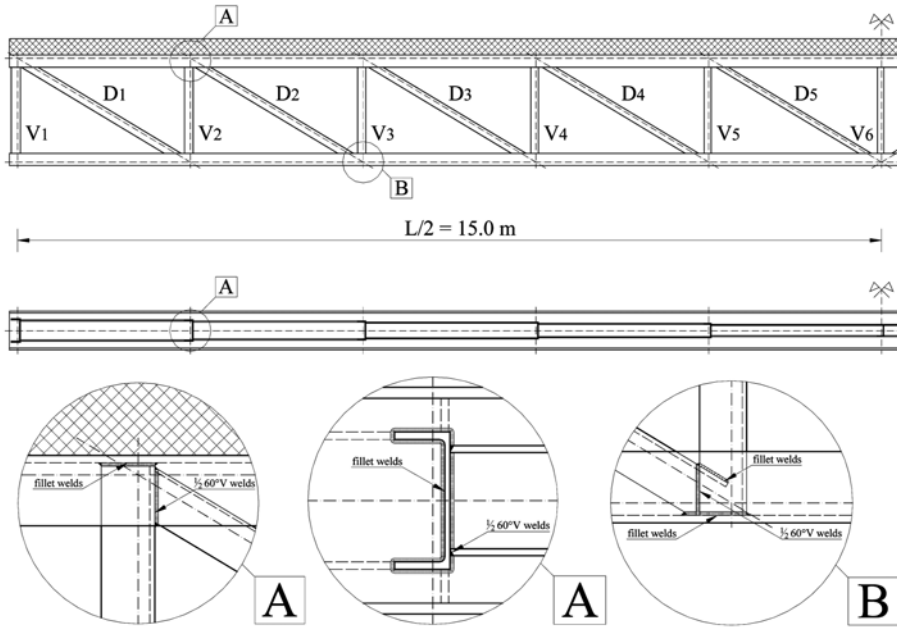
Arrangement of bracing members and design of welded joints
